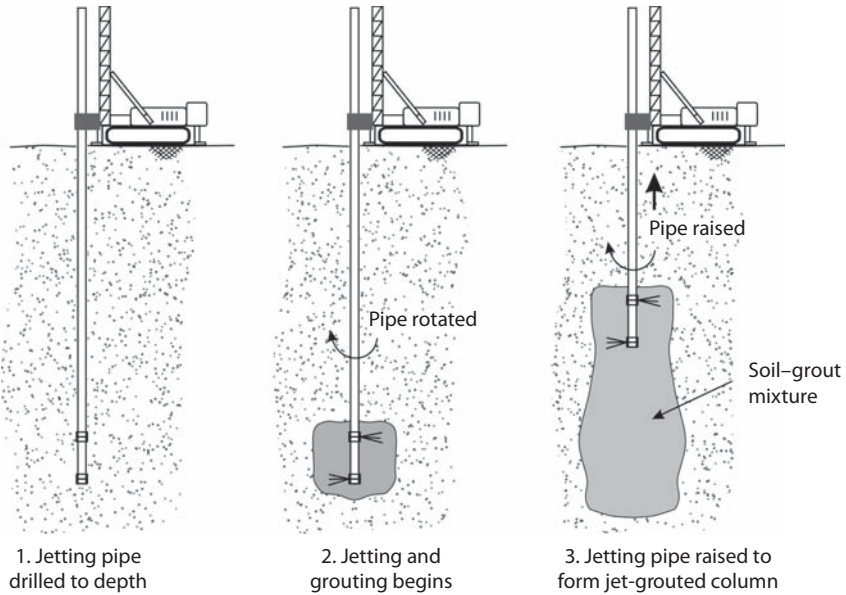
Jet grouting. High-pressure water or grout jets are used to form a column of disturbed soil around the jetting pipe, flushing away a significant proportion of the soil particles, which are replaced by grout to form a column of soil-grout mixture.
